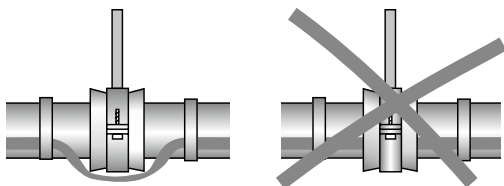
Feed cable over pipe hangers, do not trap the cable!
